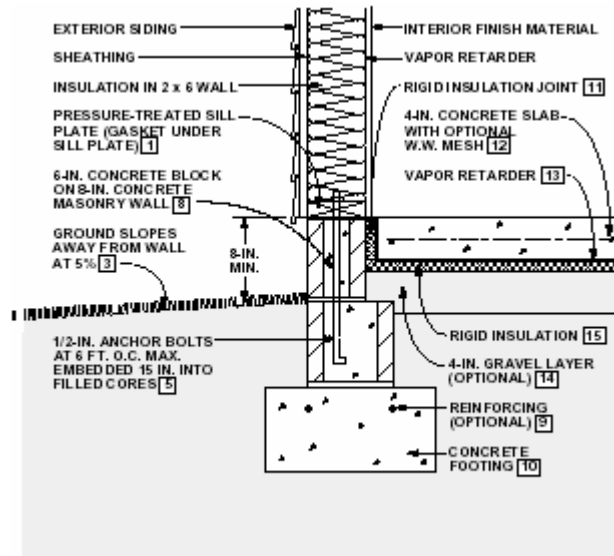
illustrates a slab-on-grade with a concrete masonry foundation wall. Rigid insulation is placed horizontally under the slab perimeter and vertically in the joint at the slab edge. In order to permit vertical movement of the floor slab, 6-inch wide concrete blocks are used in the top course. This approach utilizes a 2 x 6 above-grade wood frame wall.
